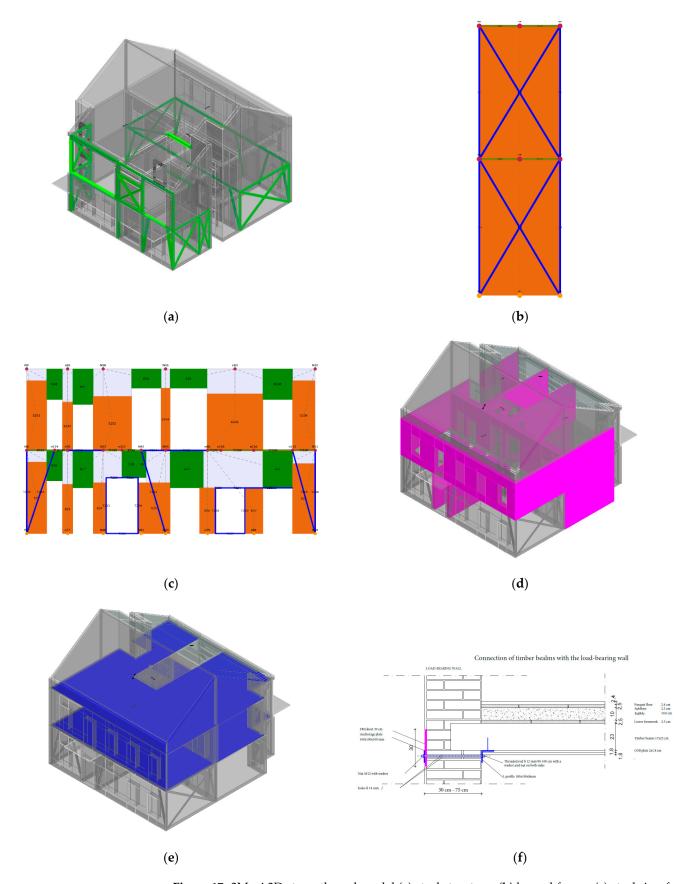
3Muri 3D strengthened model (a) steel structure; (b) braced frame; (c) steel ring-frame around the doors; (d) Strengthening of the walls with FRCM; (e) Strengthening of the walls with OSB; (f) Connection of the timber beams with load-bearing walls.
